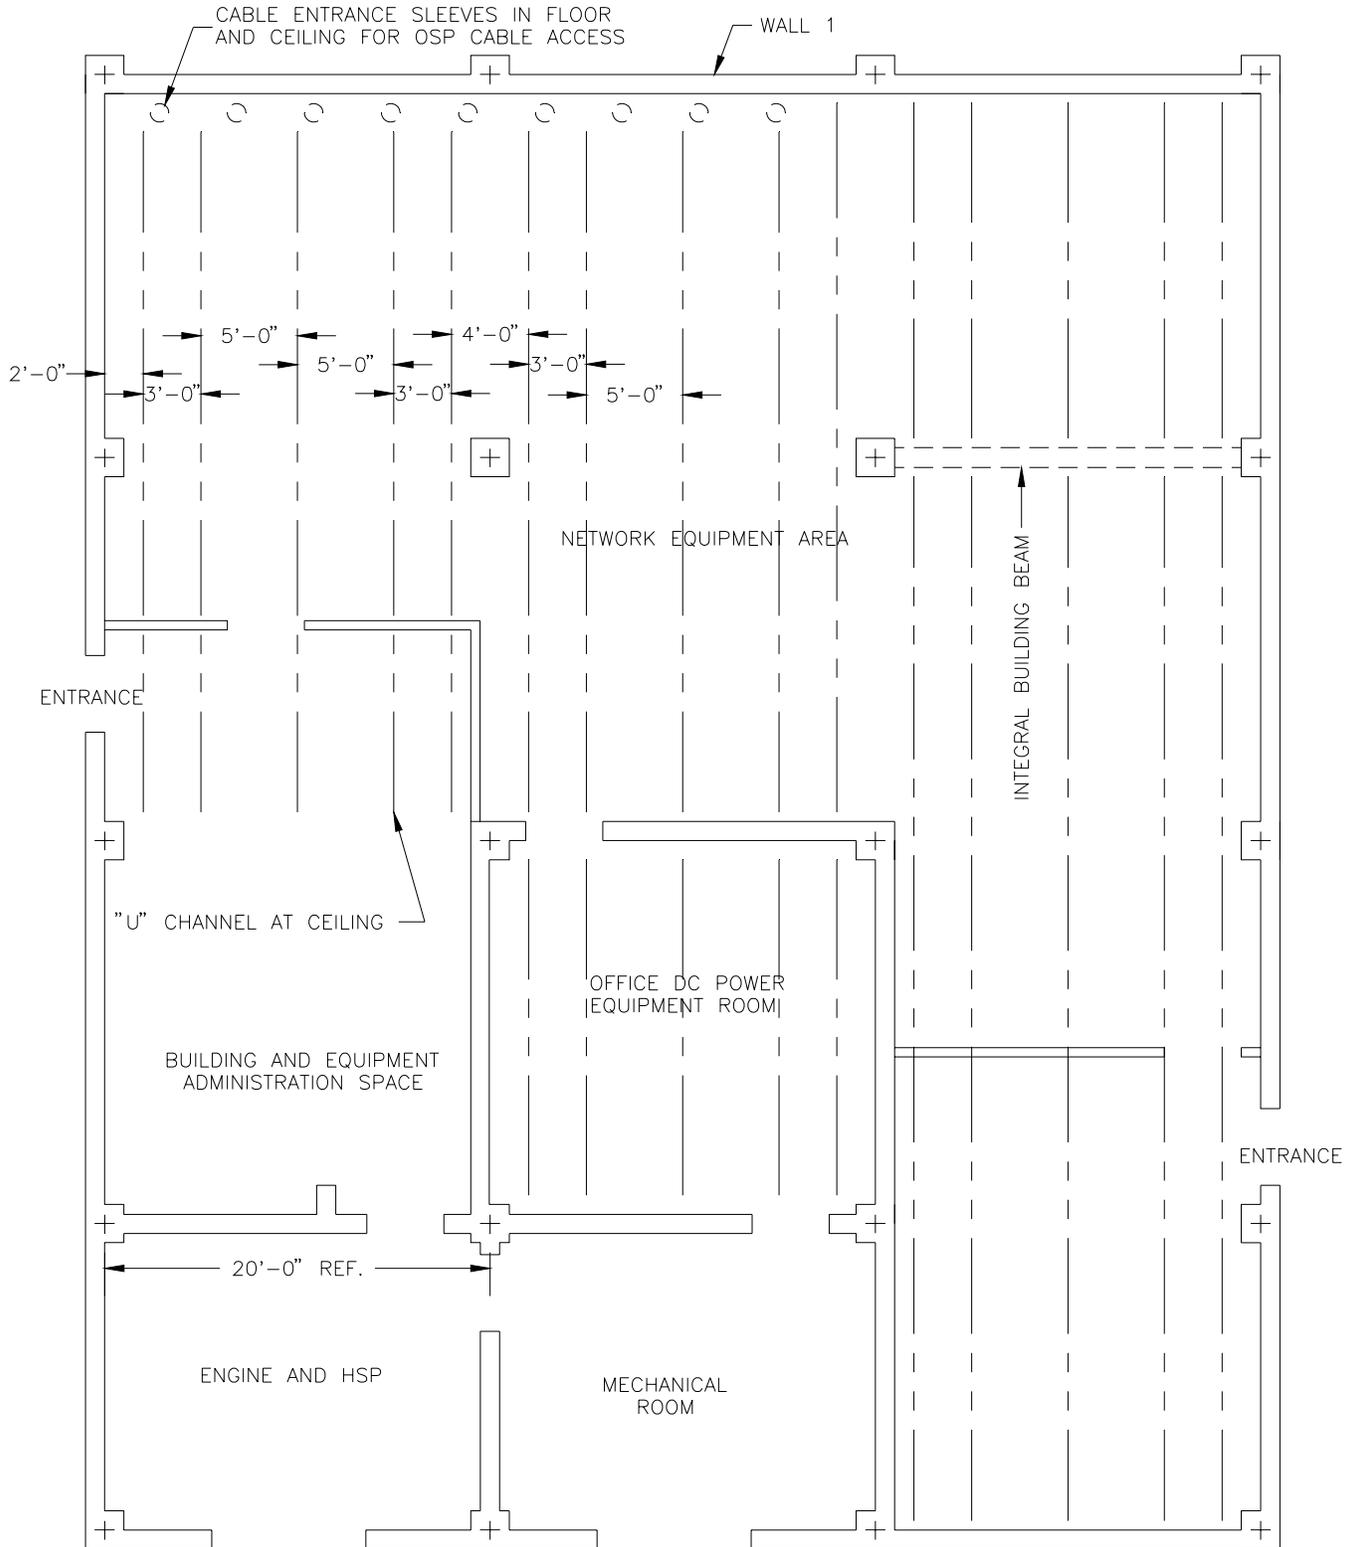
Generic Layout Of Office Superstructure Support Channel
